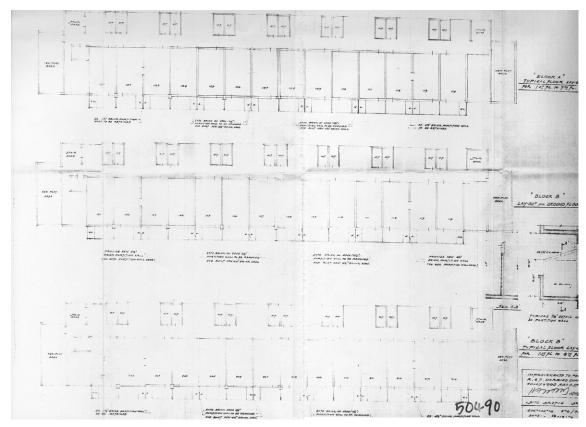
Architectural drawings for the improvements to Block A and B. (Courtesy of Architectural Services Department, Hong Kong SAR Government, Typical Floor Layout for Ground to 6<sup>th</sup> Floor – Improvements to Police R. & F. married Quarters, Hollywood Road Station, 1976, drawing no.: SK1, Microfilm ID: 50490.)
